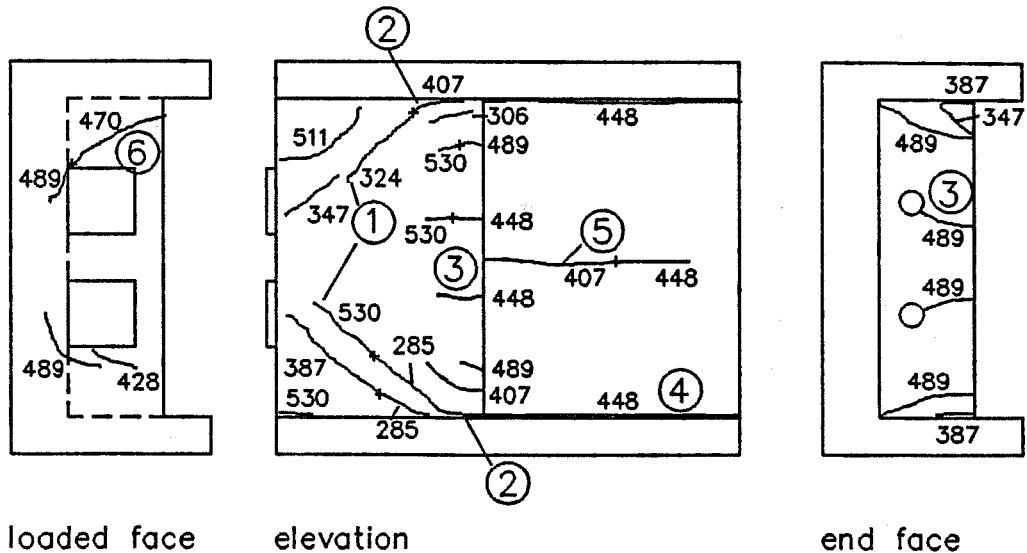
Typical Crack Pattern in Diaphragm Specimens (Dia3)
